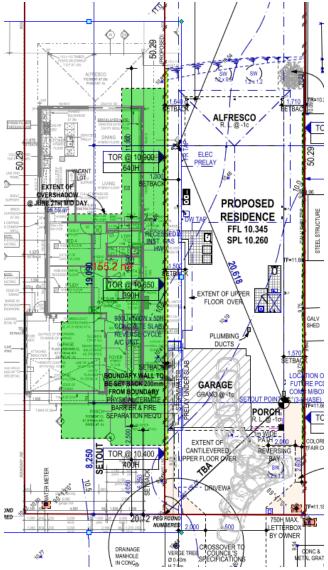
Shows the maximum southern shadow generated (in green) onto the southern affected lot approved ground floor plan.
